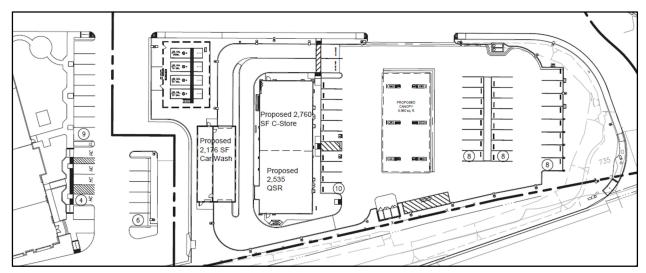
PROPOSED PROJECT SITE PLAN
